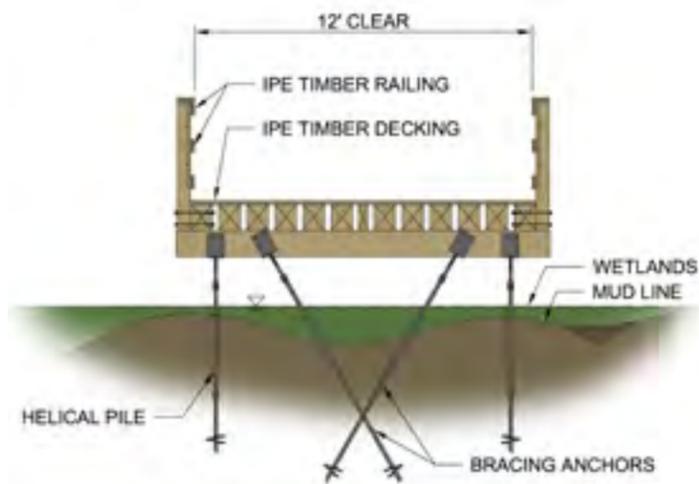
SECTION C-C: TYPICAL TRAIL BOARDWALK SECTION
